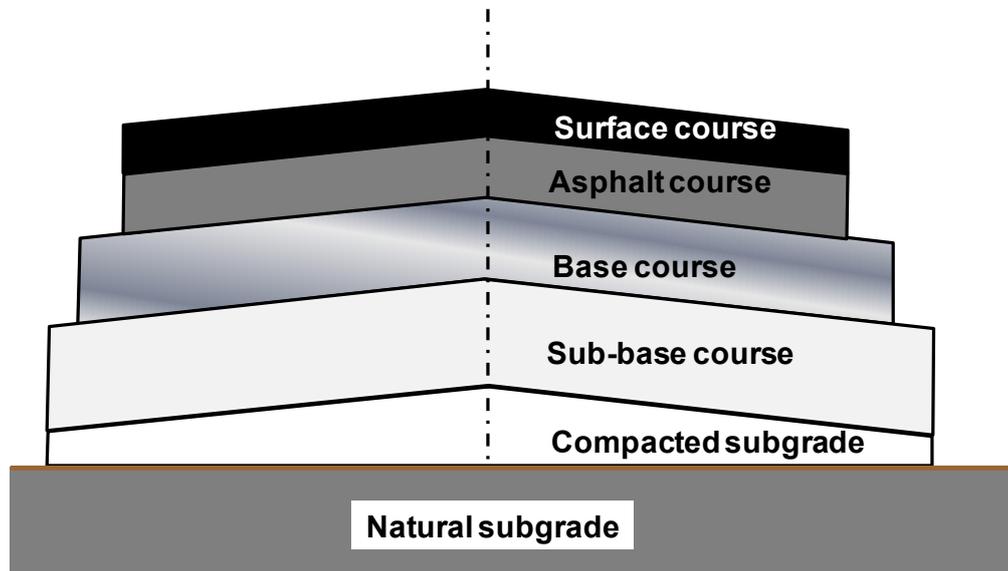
Typical cross section of a flexible pavement where a combination of the above layers can be used.
